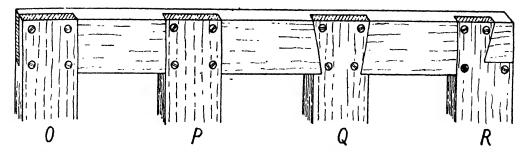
O.—Corner Joint with Parts halved. P.—Intermediate Joint. Q.—Dovetail Joint. R.—Corner Joint with a Dovetail.
